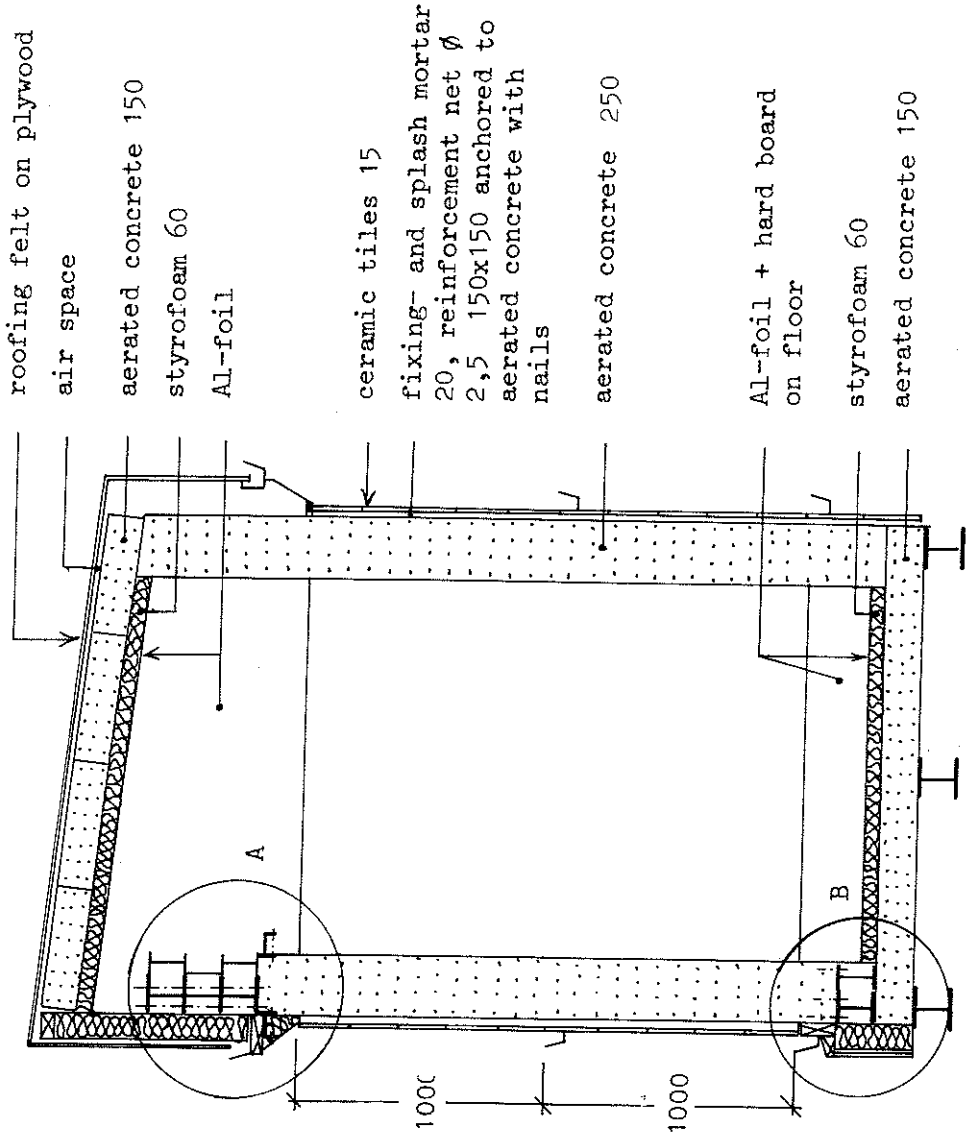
Test house II, vertical cross section a-a with hydraulic loading arrangements. Scale 1:30 and 1:10 (details A and B)
